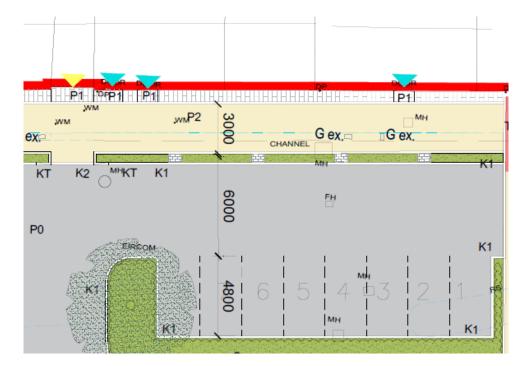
Proposed Plan showing the footpath provision from the building edge to the new parking space to the North of Church Street.
